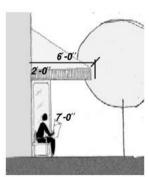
(E): Examples of encroachments into the sidewalk.
